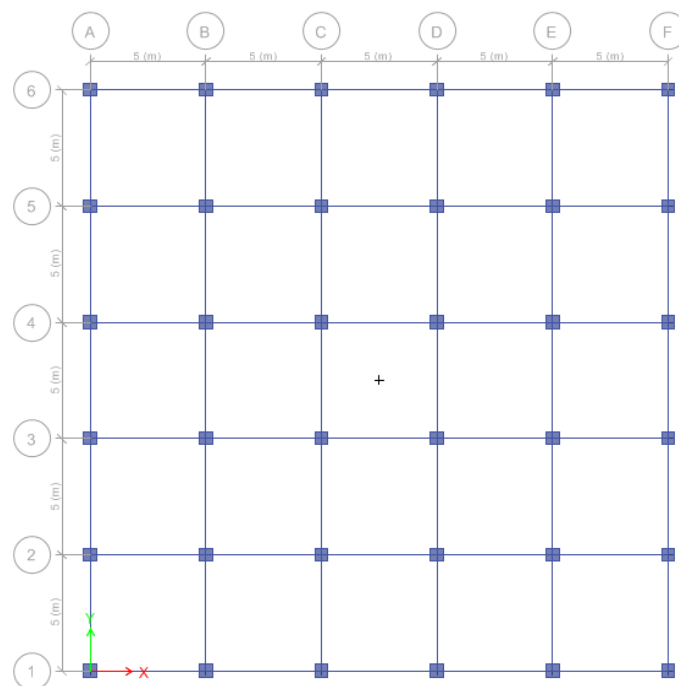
Typical floor plan of 3 and 8-story buildings.
